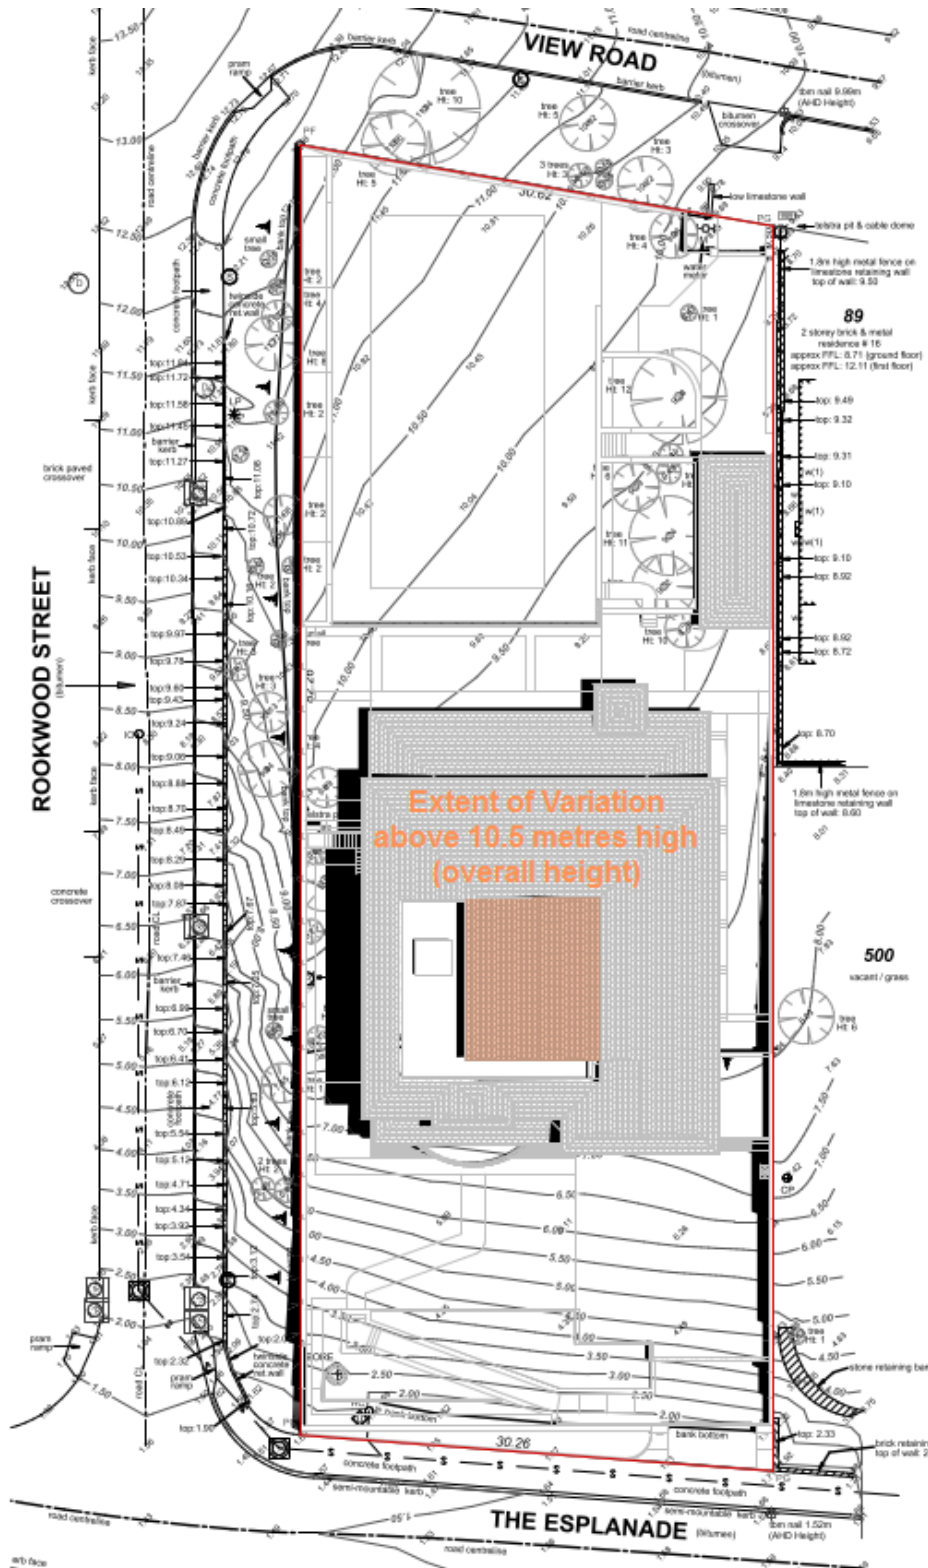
Roof plan of the subject dwelling identifying the portion of dwelling exceeding the overall 10.5 metre building height.
